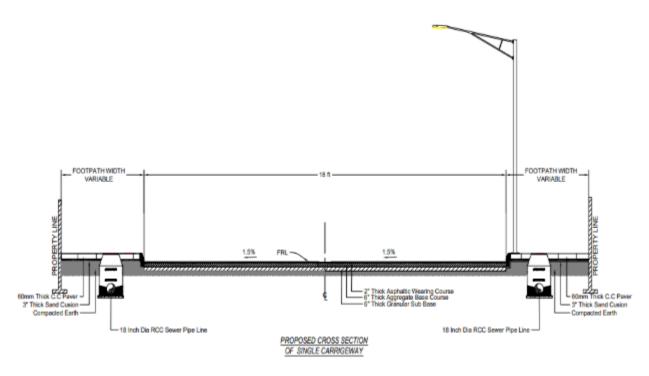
18' Wide Road (Single Carriageway) Cross section
